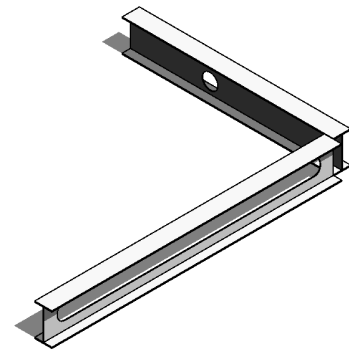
Structural beams with a circular opening and a rectangular opening with a fillet
